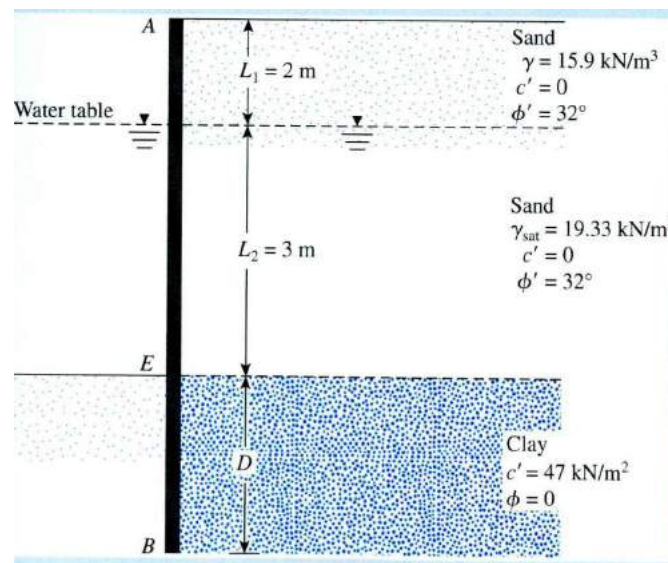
Cantilever sheet pile penetrating into saturated clay
